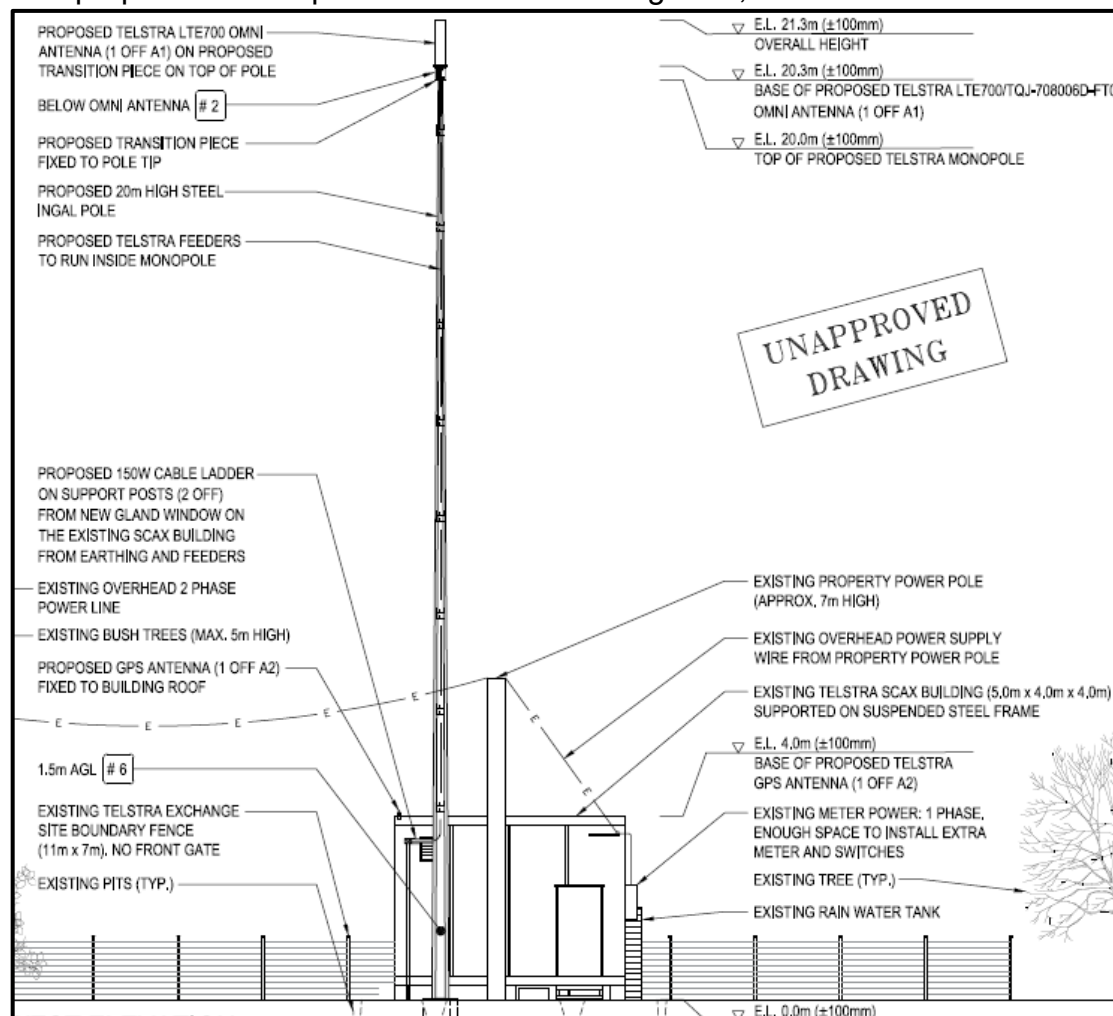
The proposed development – Western Elevation (note: some features shown on the plan are existing)
